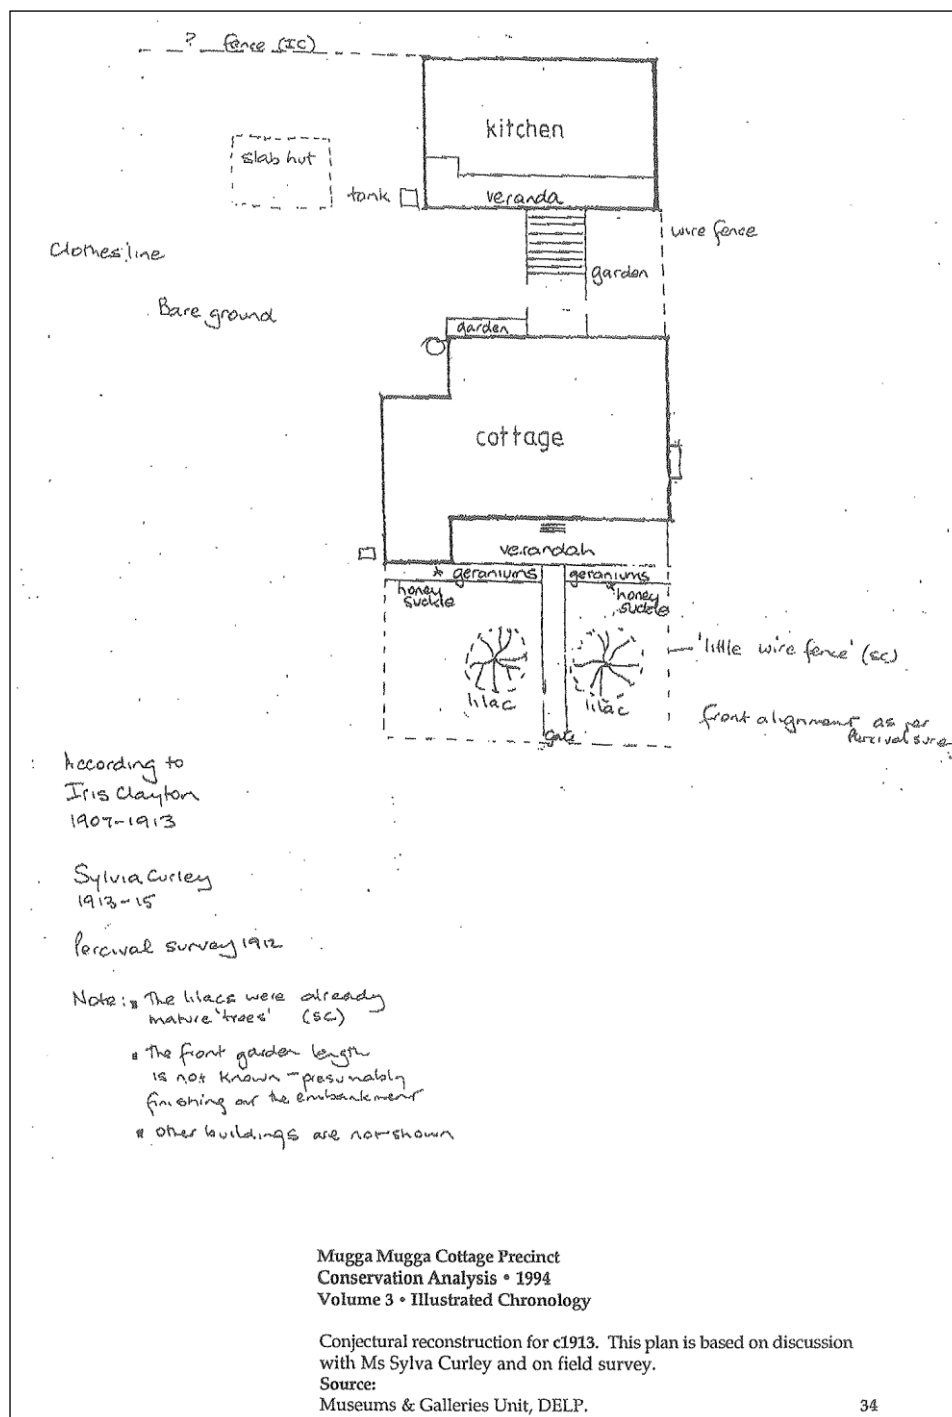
c1913 'Conjectural Reconstruction' Plan from interview with Iris Clayton and Sylvia Curley
